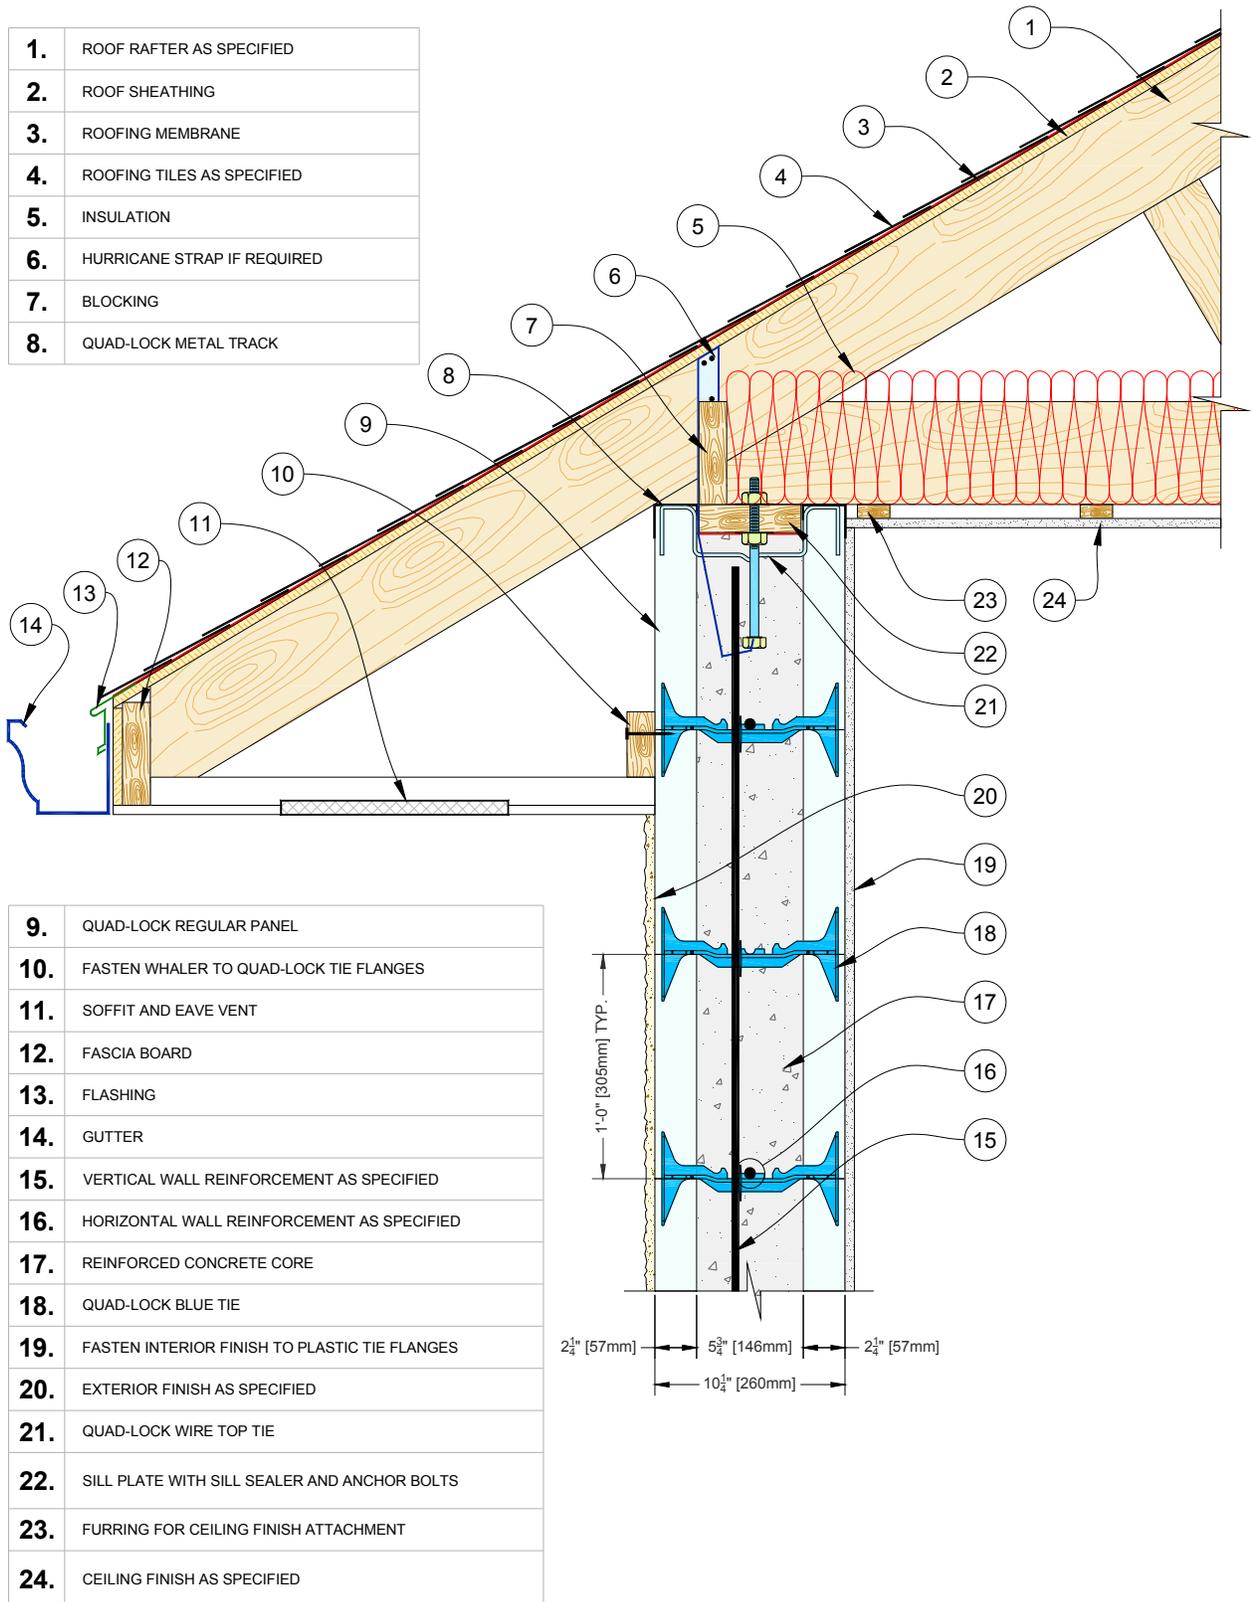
Typical Roof Rafter or Truss - Low Uplift Connection
